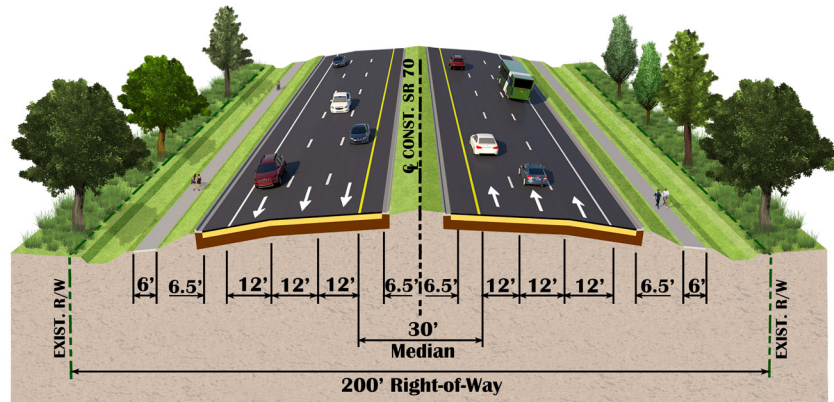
Lorraine Road to east of Greenbrook Boulevard
